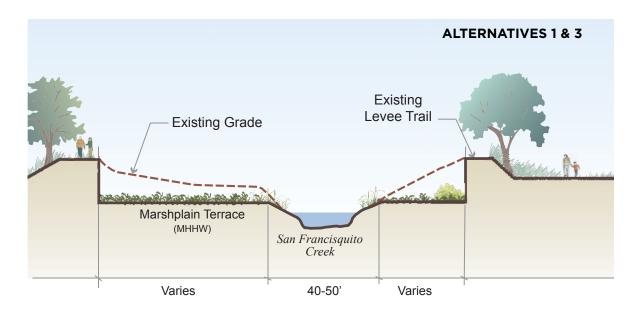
| CROSS SECTION A, VIEW LOOKING DOWNTREAM
